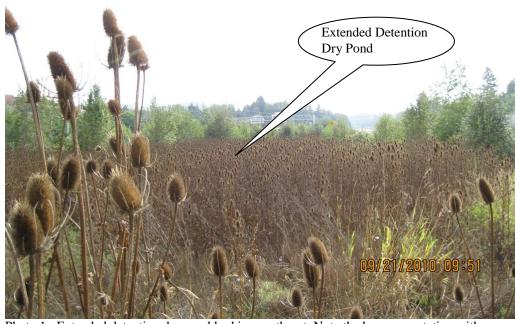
Extended detention dry pond looking northeast. Note the heavy vegetation with cattails.
